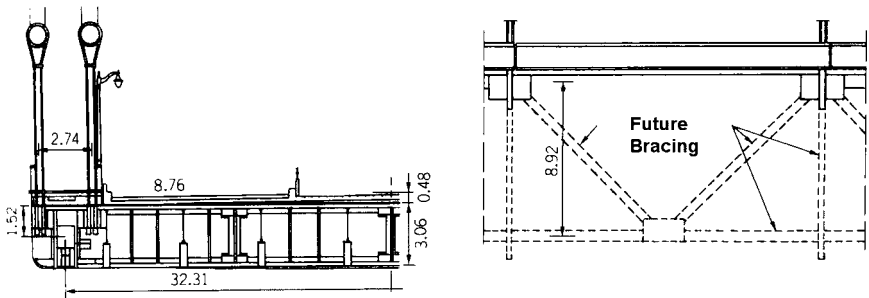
As-built suspended structure of the George Washington Bridge in 1931.
